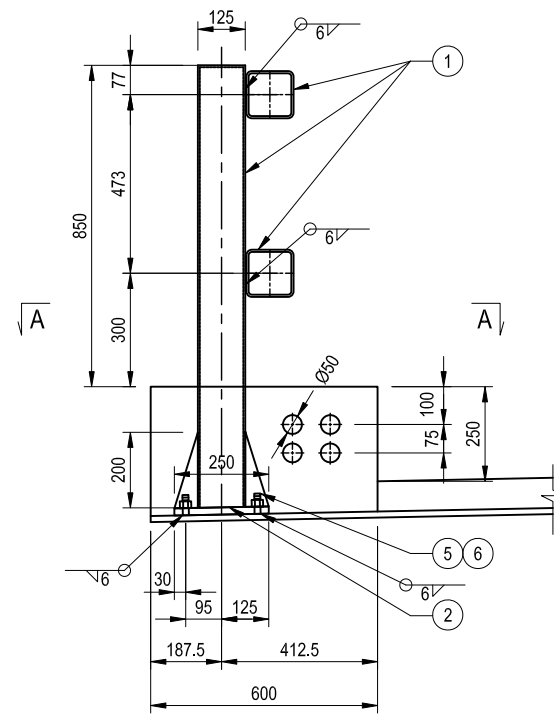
DETAIL OF COPING AND BARRIER FOR STEEL BOX GIRDER (1)
